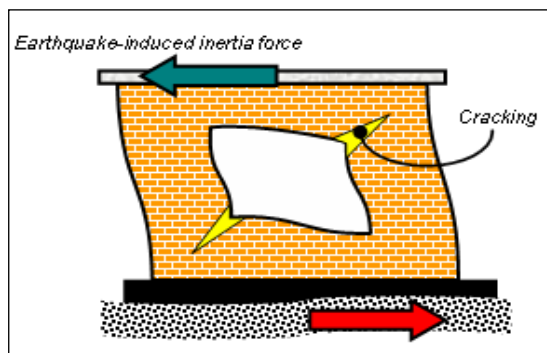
Shear Failure Mechanism at the edge of the Opening of the Wall
